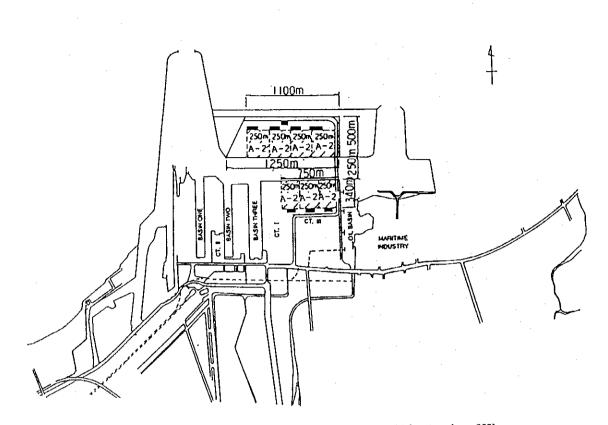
Layout of Tanjung Priok Port (Alternative II)
